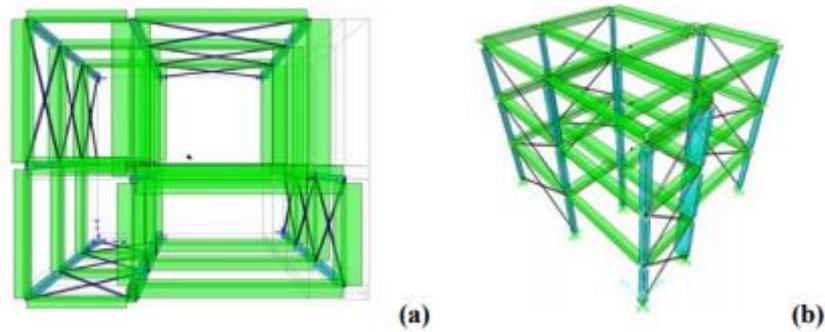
Bracing Configuration: Plan (a) and 3D (b) [20]
